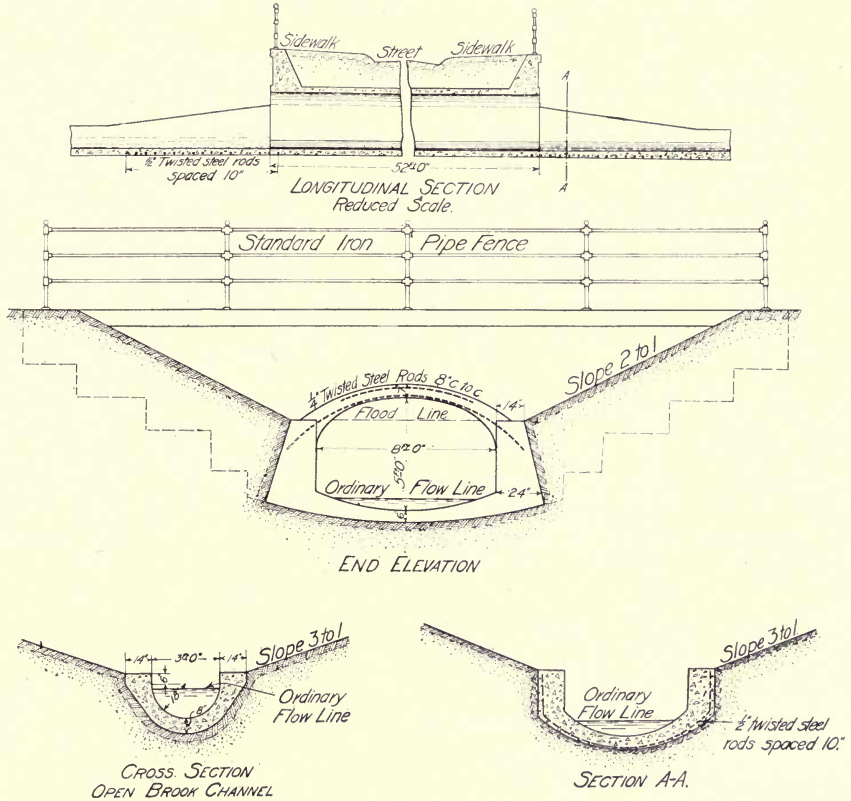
CONCRETE BROOK LINING IN NEWTON, MASS.
